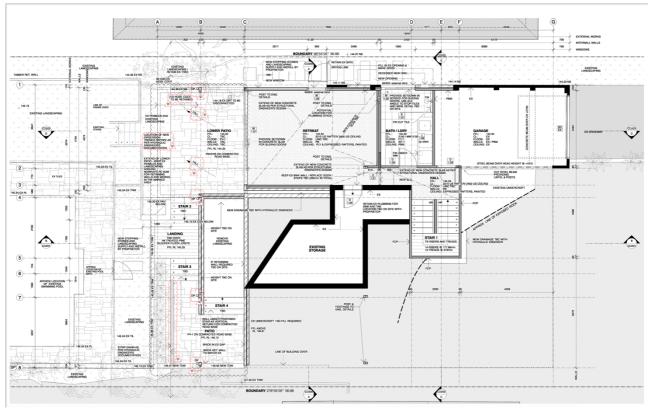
CDC Lower Ground Floor Plan 11 Jones Street, Beacon Hill
